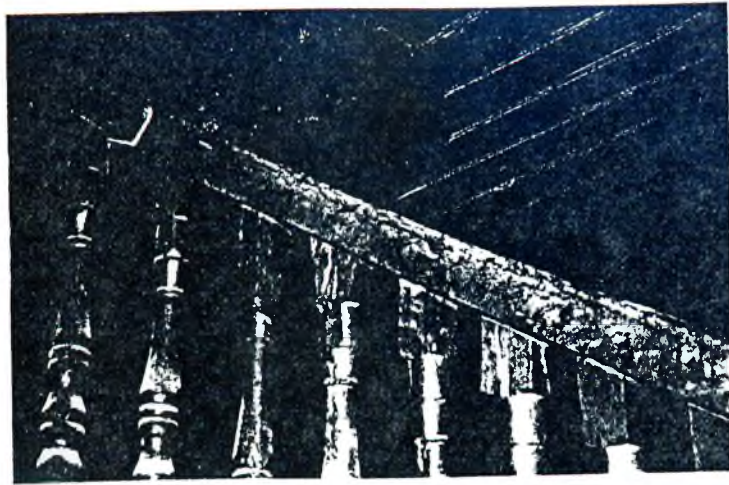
Interior view showing the round staircase and the opening at the floor of the mezzanine floor
